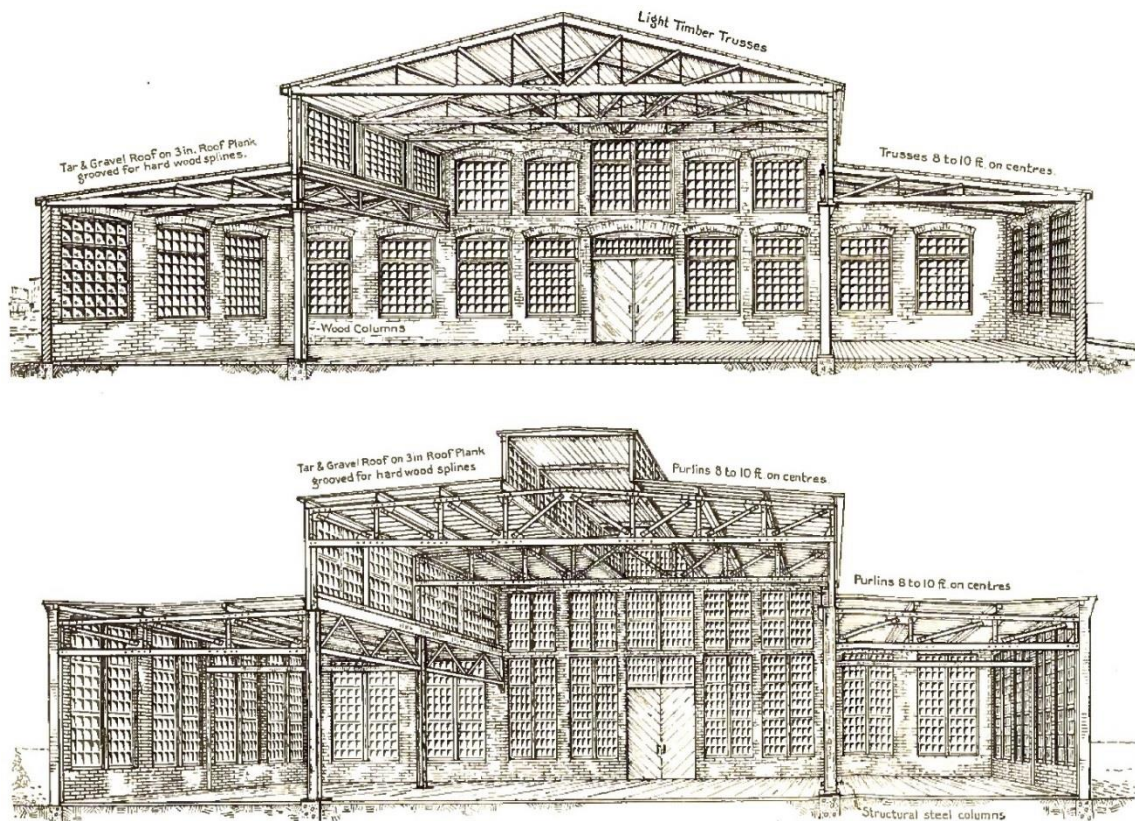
Example of c. 1900 production shed construction using masonry walls and timber framing (top) and steel frame construction (bottom).<sup>124</sup>
